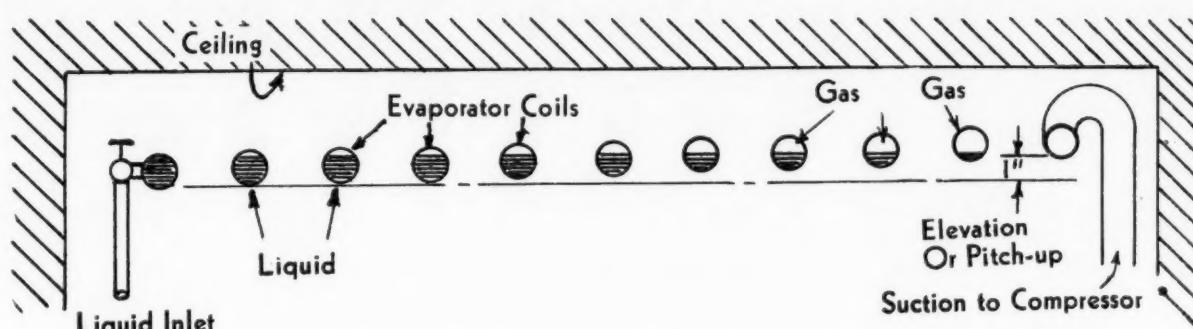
Diagram shows how, in a horizontal coil evaporator installed on the ceiling, liquid refrigerant is confined to the bottom of each pipe.
